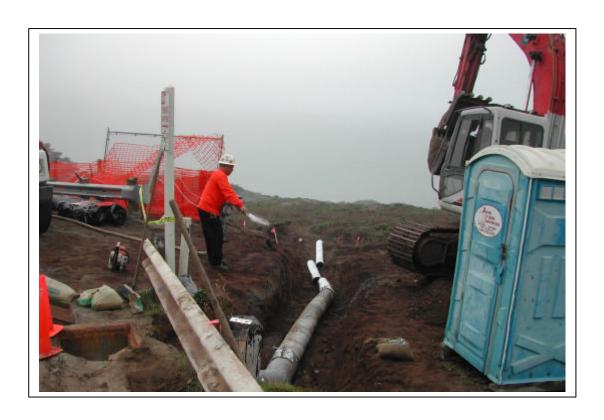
Replacement and Extension of Storm Drain Outfall from Southbound Lincoln Boulevard
